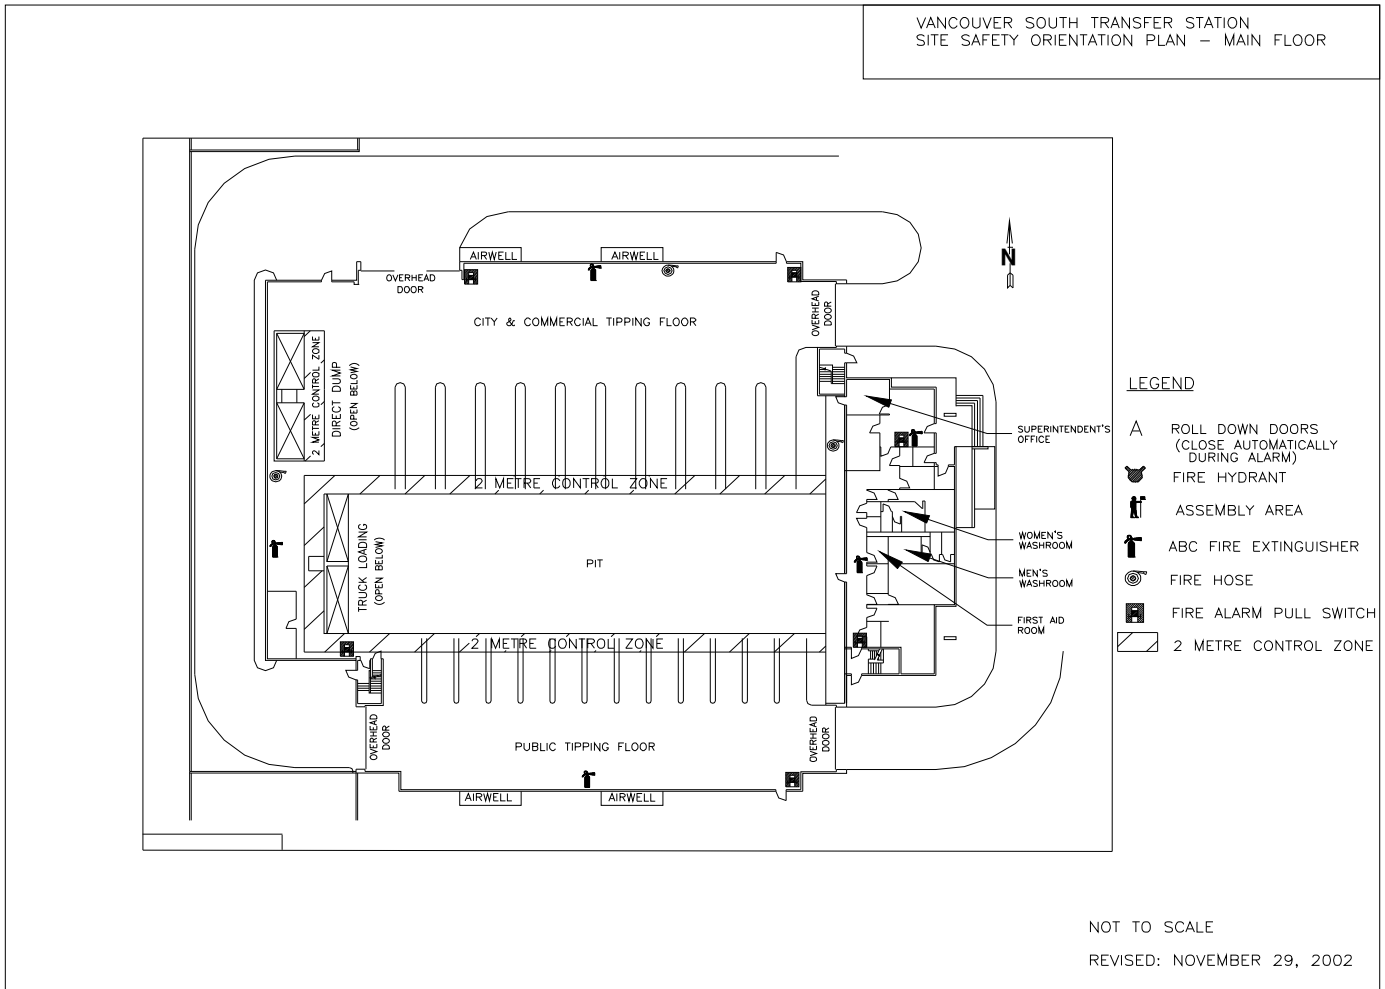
Vancouver South Transfer Station, Main Floor, Plan View
